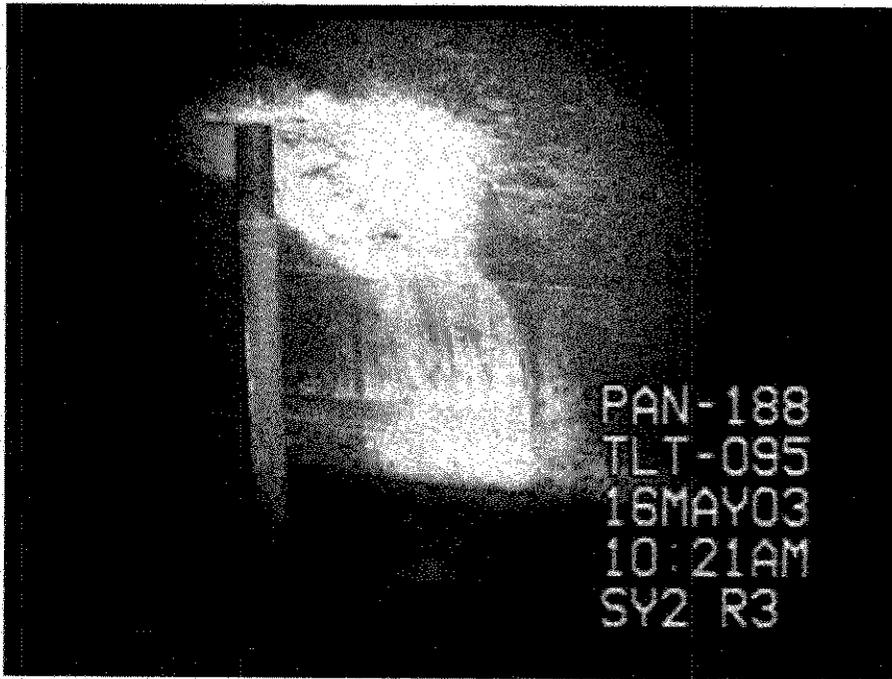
SY-102 Riser 3, Primary Tank Interior, Stain on Interior Wall at Riser (2003)
